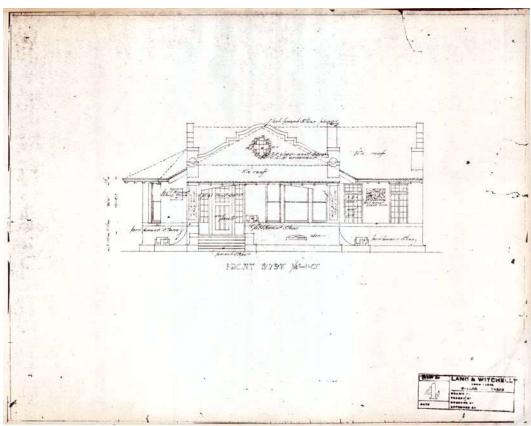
Original Lang and Witchell Front (Southeast) Elevation – Sheet 4
